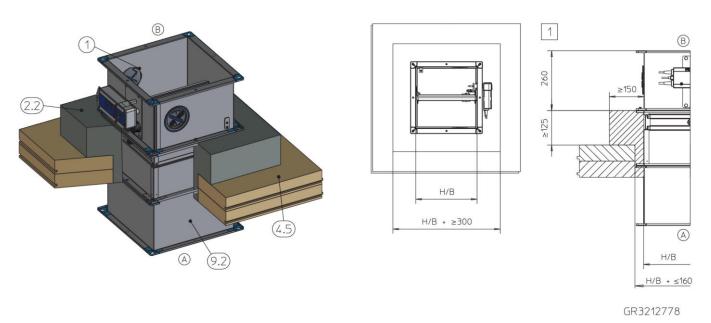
Mortar-based installation into a solid wood ceiling, upright (illustration is an example; installation into other types of solid wood ceiling systems may be possible depending on local conditions)
